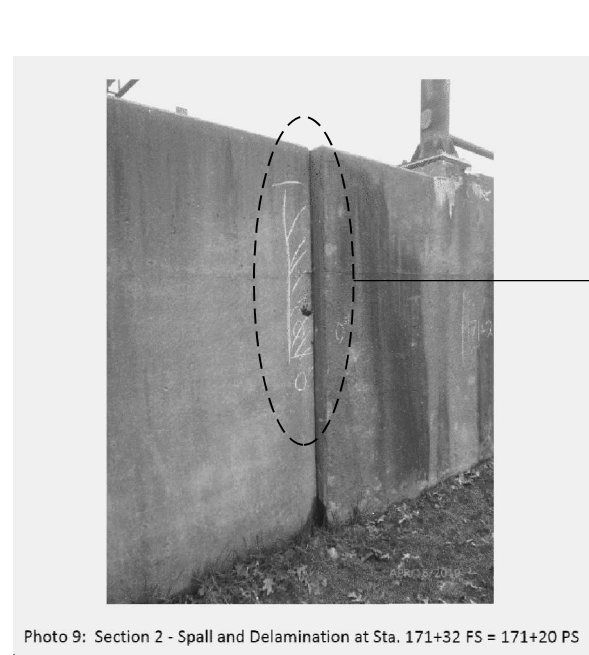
Section 2 - Spall and Delamination at Sta. 171+32 FS = 171+20 PS
